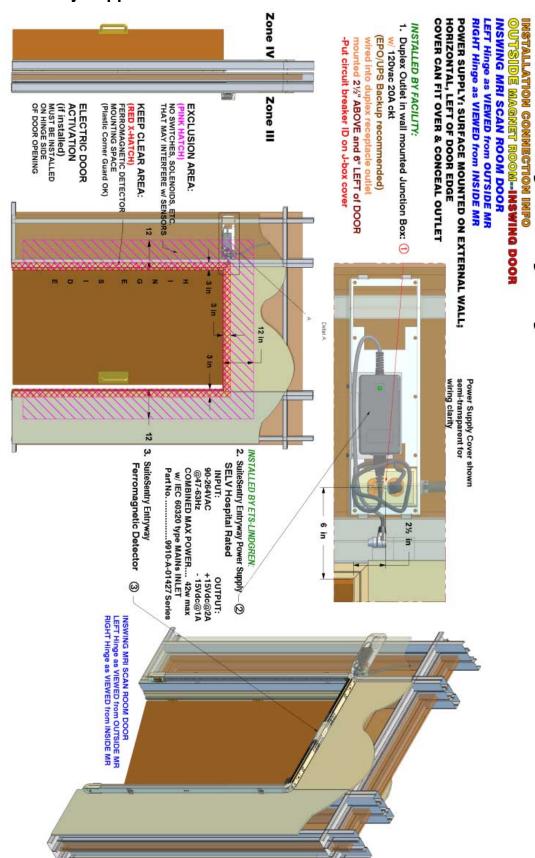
Facility Wiring OUTSIDE MR, INswing, L Hinge Door, PWR SUP Surface Mtd LEFT
